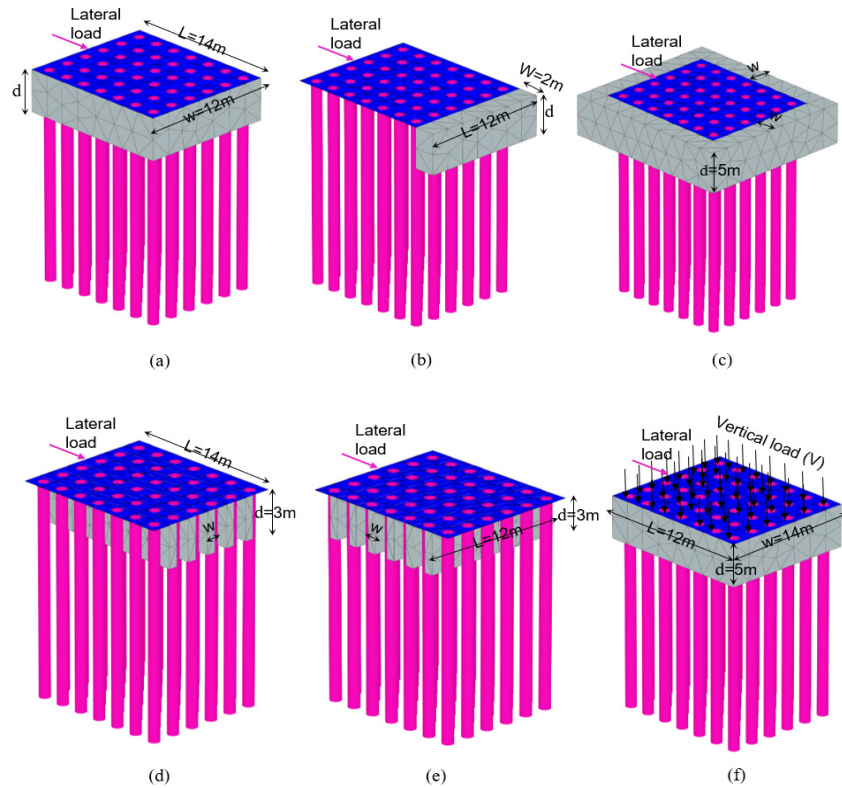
Different geometric parameters studied by PLAXIS 3D: (a) jet grout below the piled raft, (b) jet grout beside the piled raft, (c) jet grout below and around the piled raft, (d) jet grout strips parallel to lateral load, (e) jet grout strips perpendicular to lateral load, and (f) combined loads on the piled raft in grouted clay.
